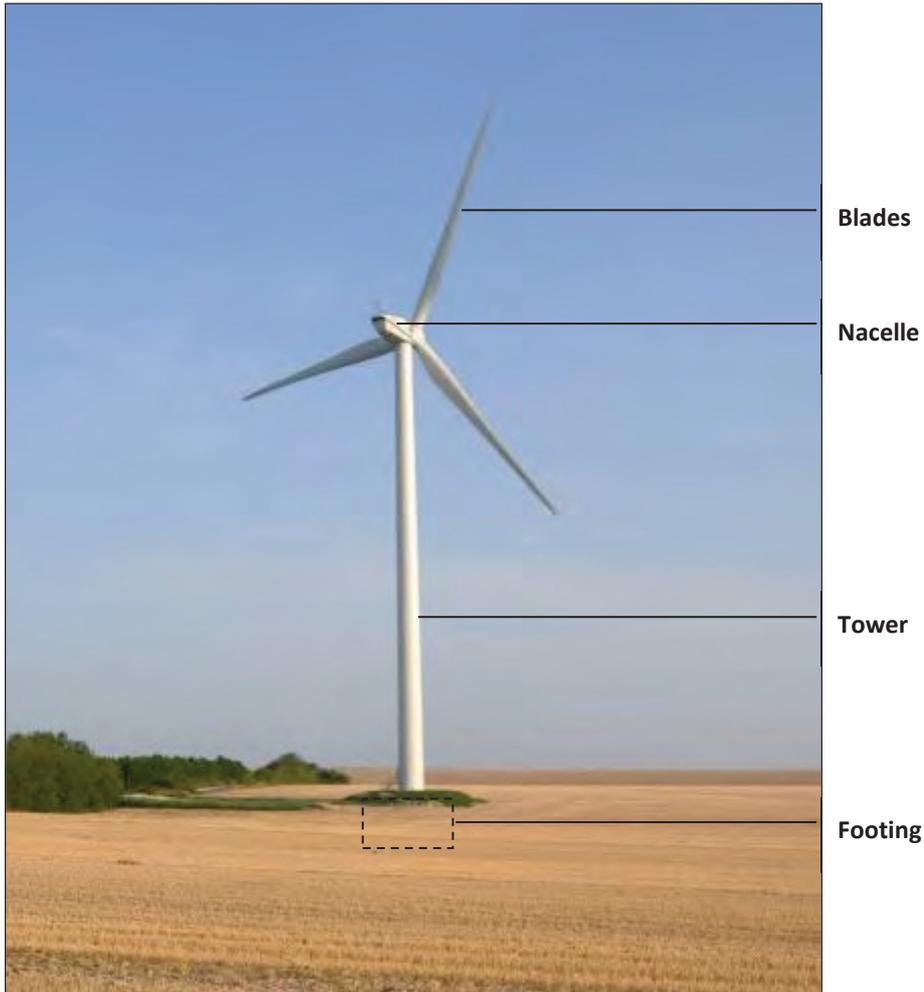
Typical wind turbine installed on an 80m tower (Photo courtesy REpower Systems AG)
